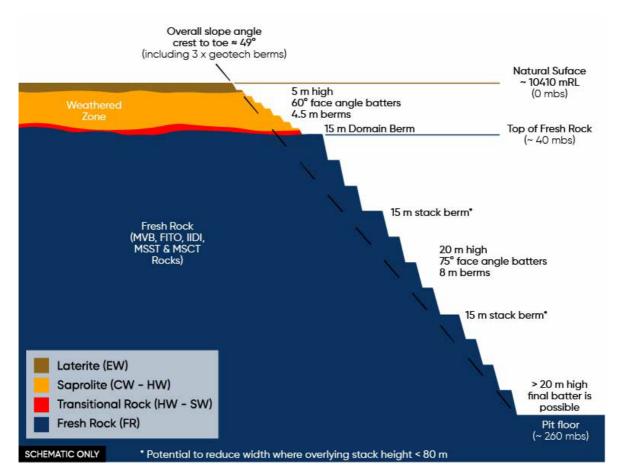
NEB Pit Domain B Wall Design Parameters
